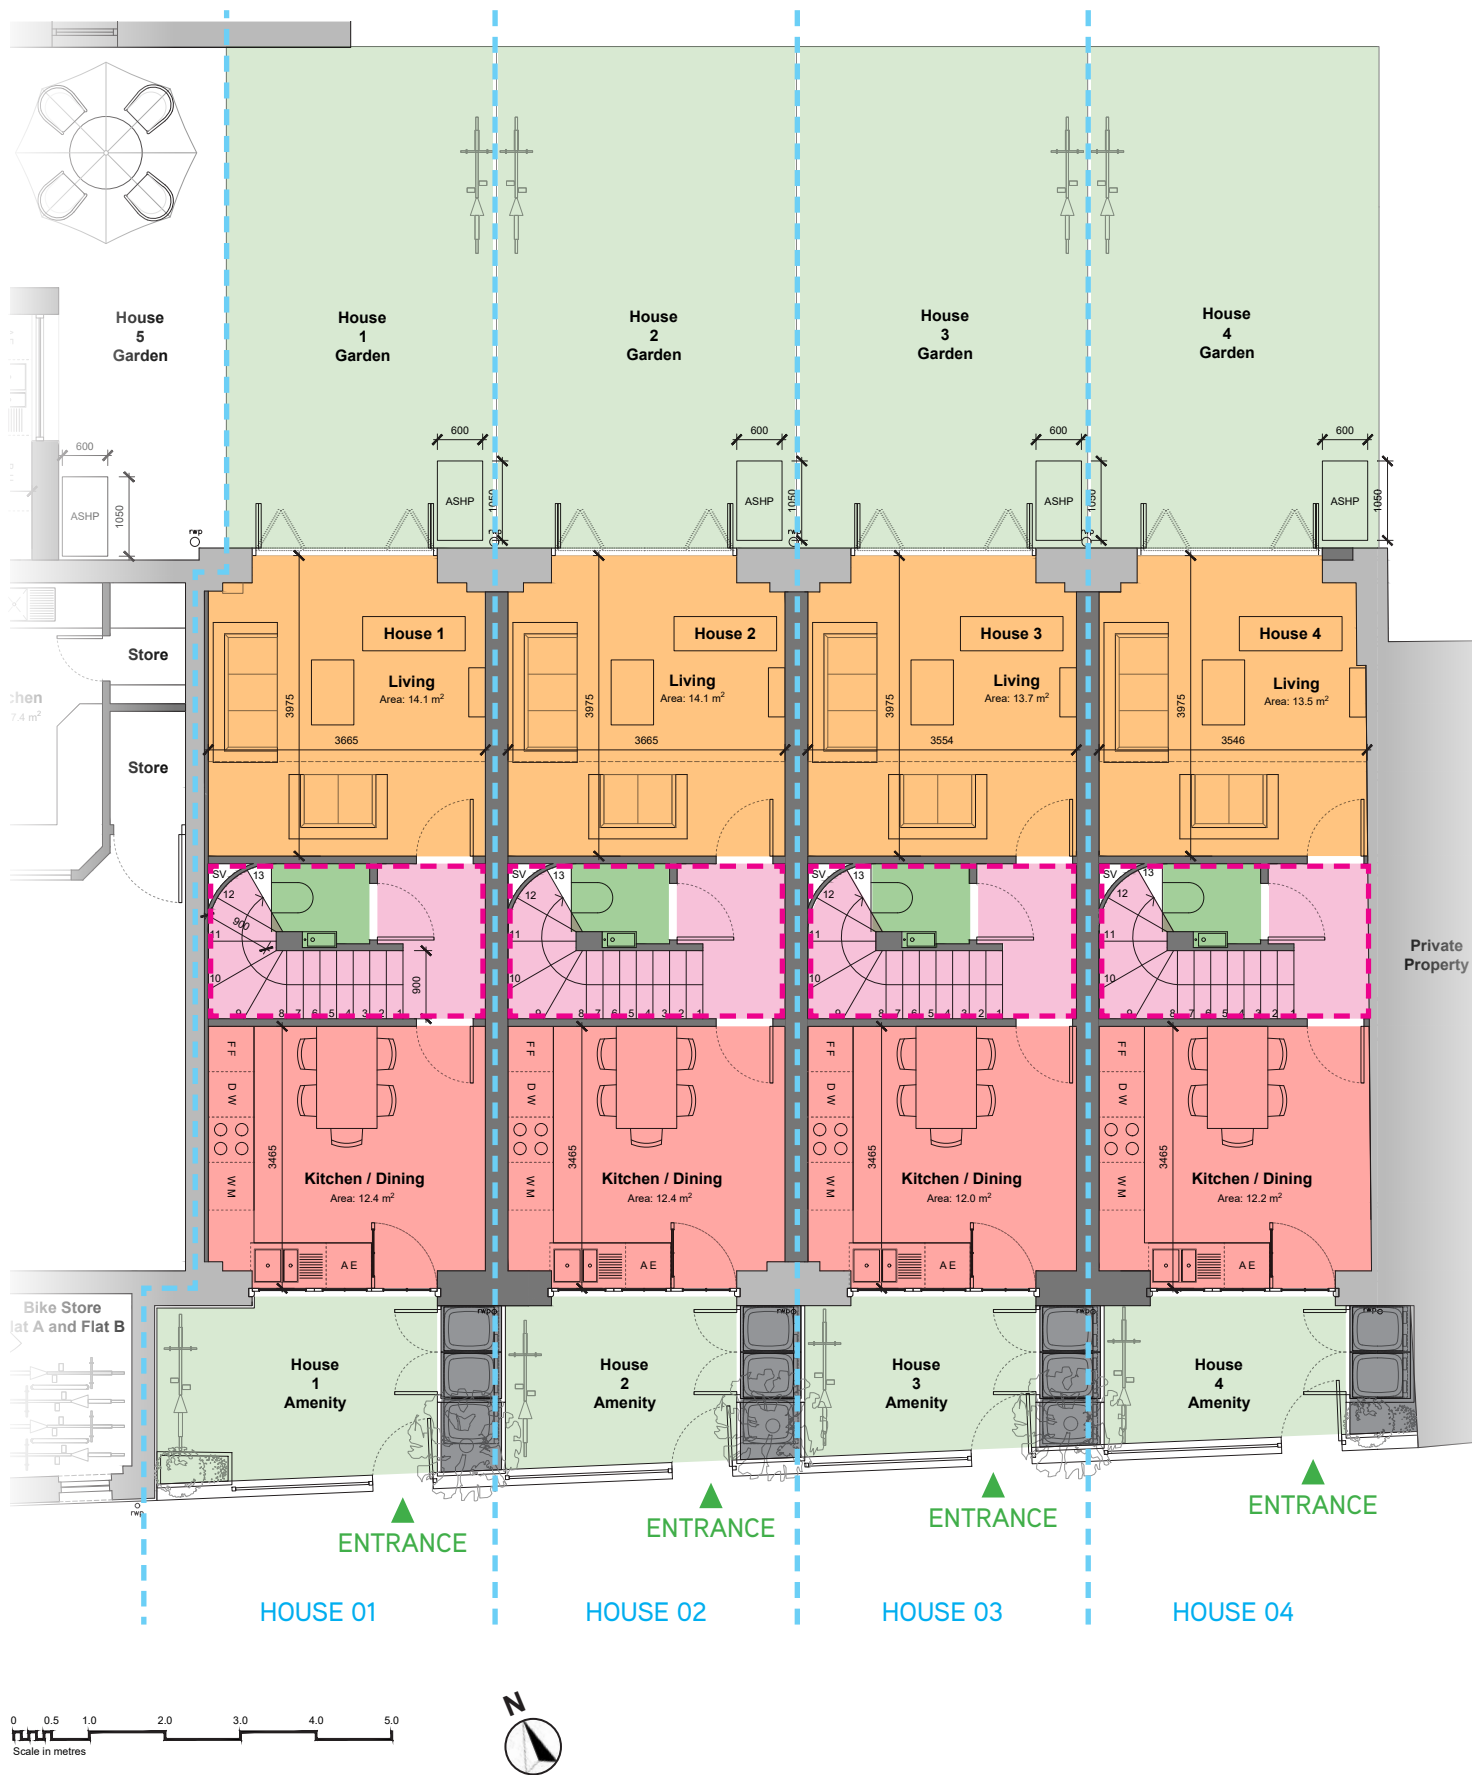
Houses 1 - 4 - Proposed Ground Floor Plan
